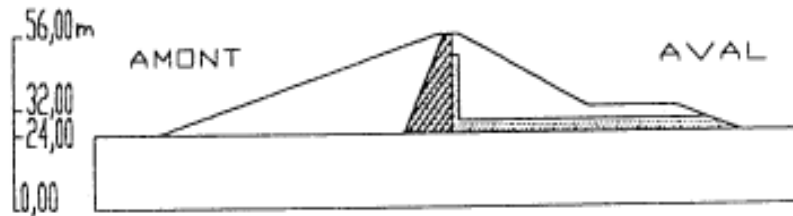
Cross-section of El Houareb dam, Elevation is in meters
